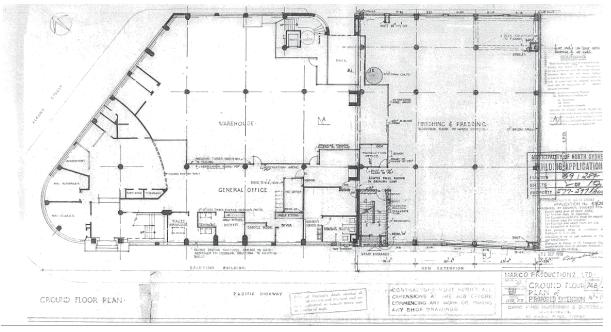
BA 284 1959 LOWER GROUND FLOOR PLAN DAVID KING ARCHITECT
